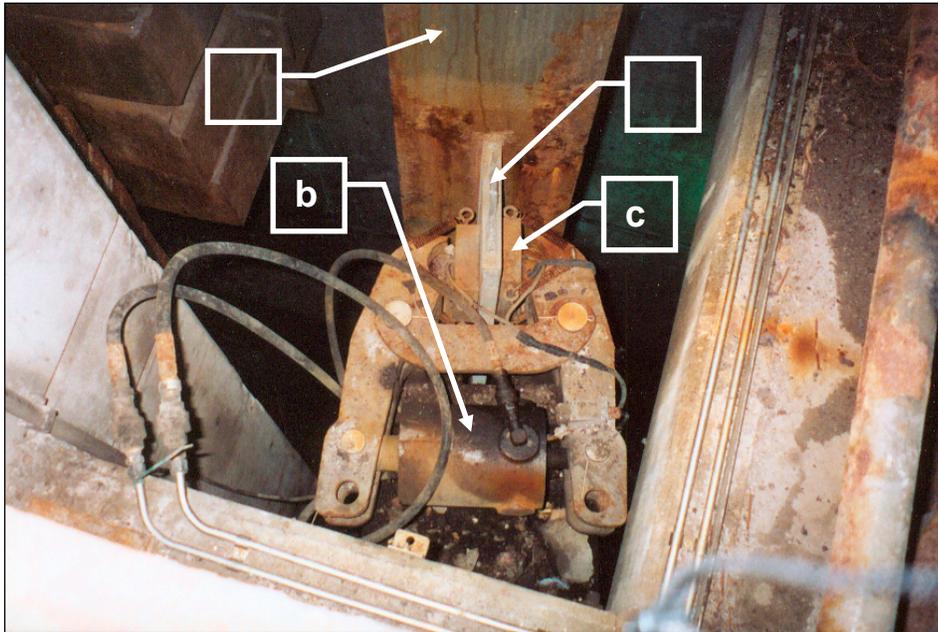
depicts the guide rail and guide rollers for the Wells Street Bridge. For this bridge the guide rail should not be lubricated because the sides of the rail head serve as the “brake drum” for the rail clamp brake.
